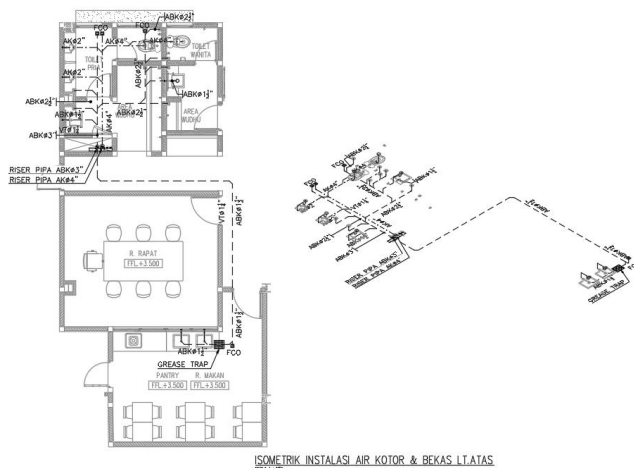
Second Floor Waste Water Pipe Line Installation Plan
